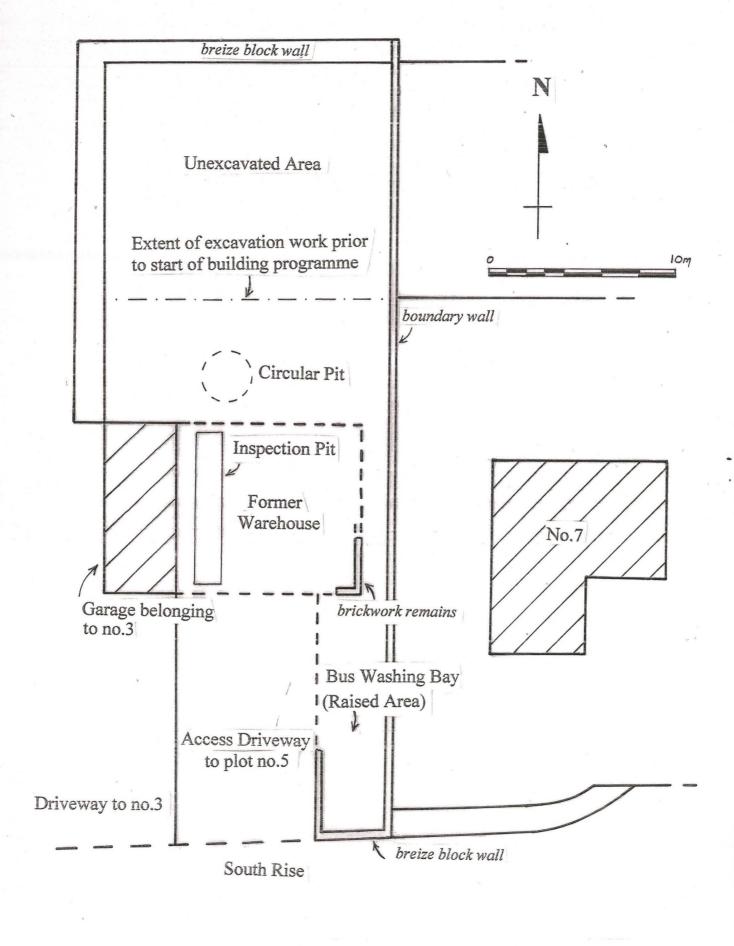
Site plan showing features identified during archaeological watching brief, scale 1:200. (Redrawn and based upon Architect's Plan, scale1:200)
